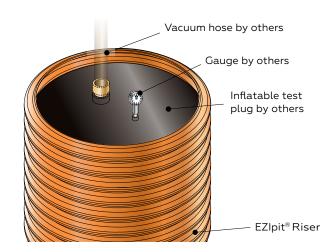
Test plug assembled in EZIpit® Riser ready for test.
